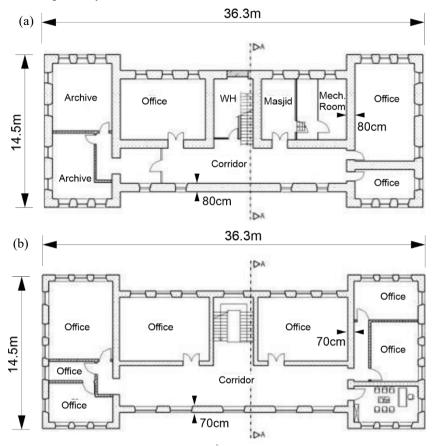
(a) Basement and (b) first-floor plan drawings of the building [22]
